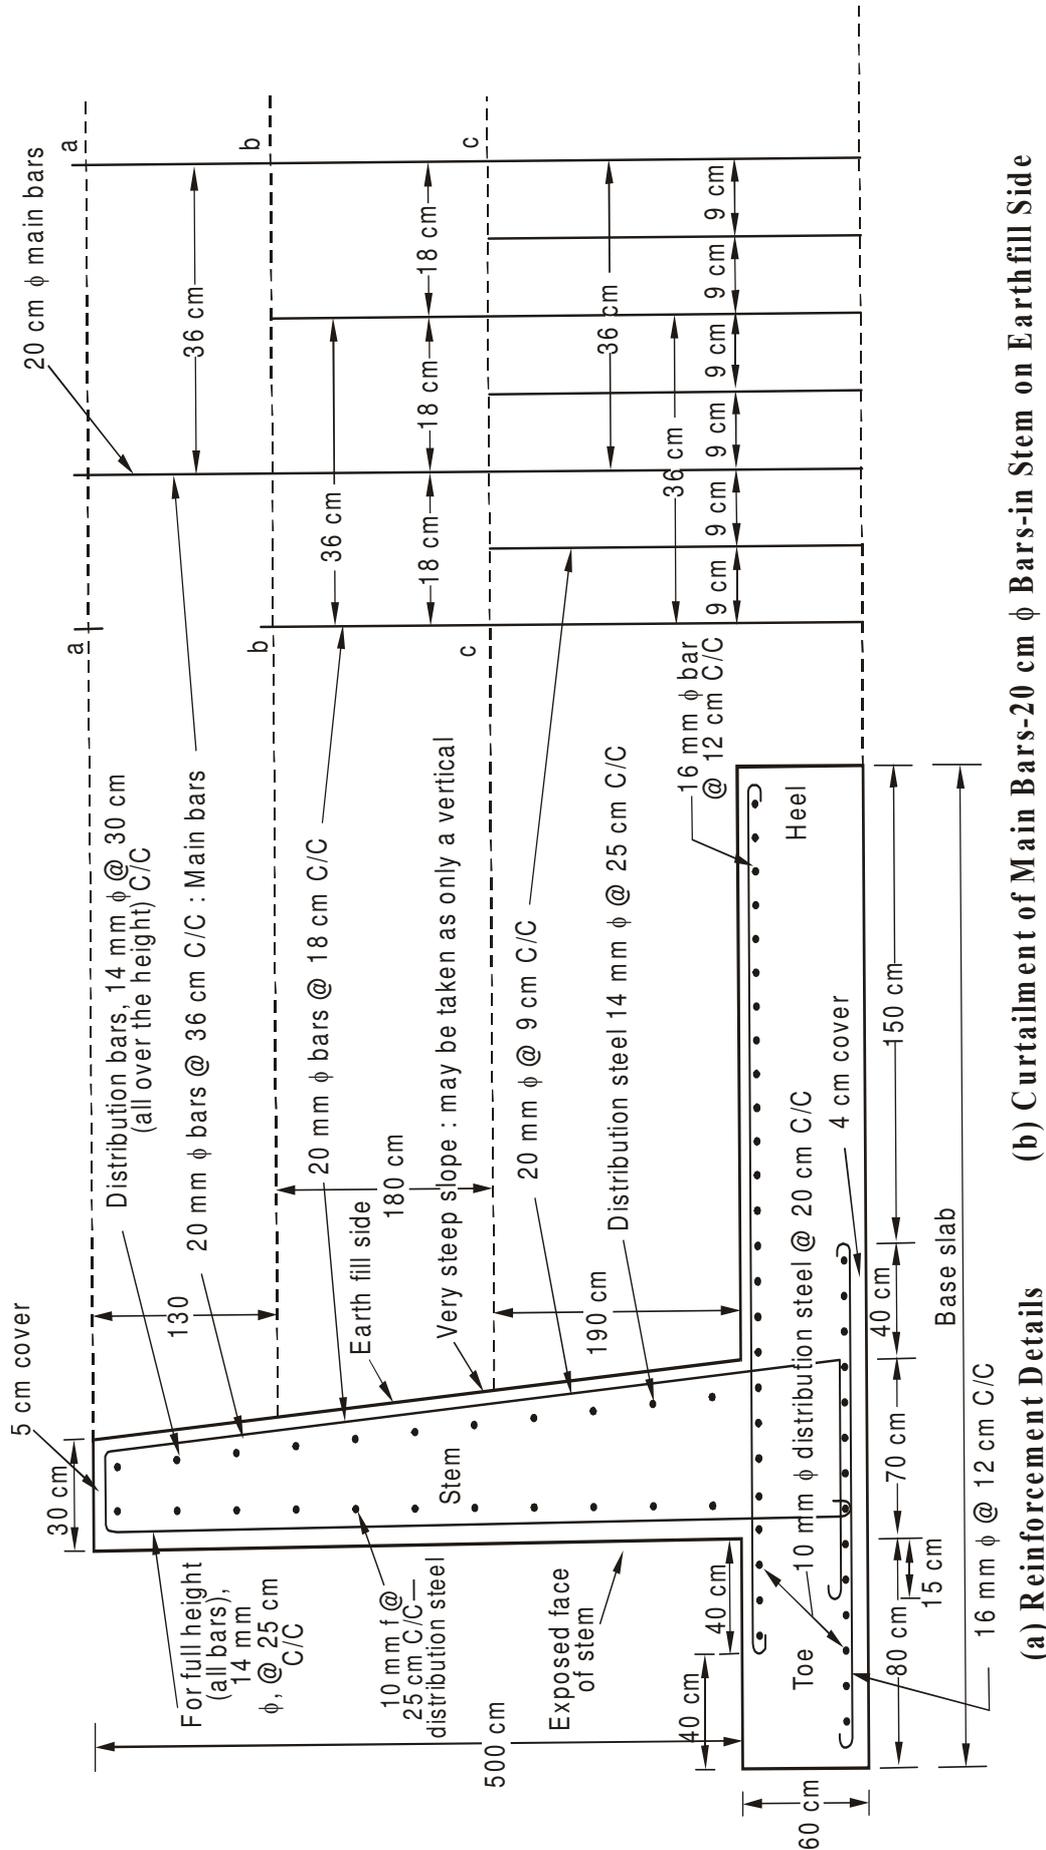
RCC Cantilever Retaining Wall Section (Not to Scale)
